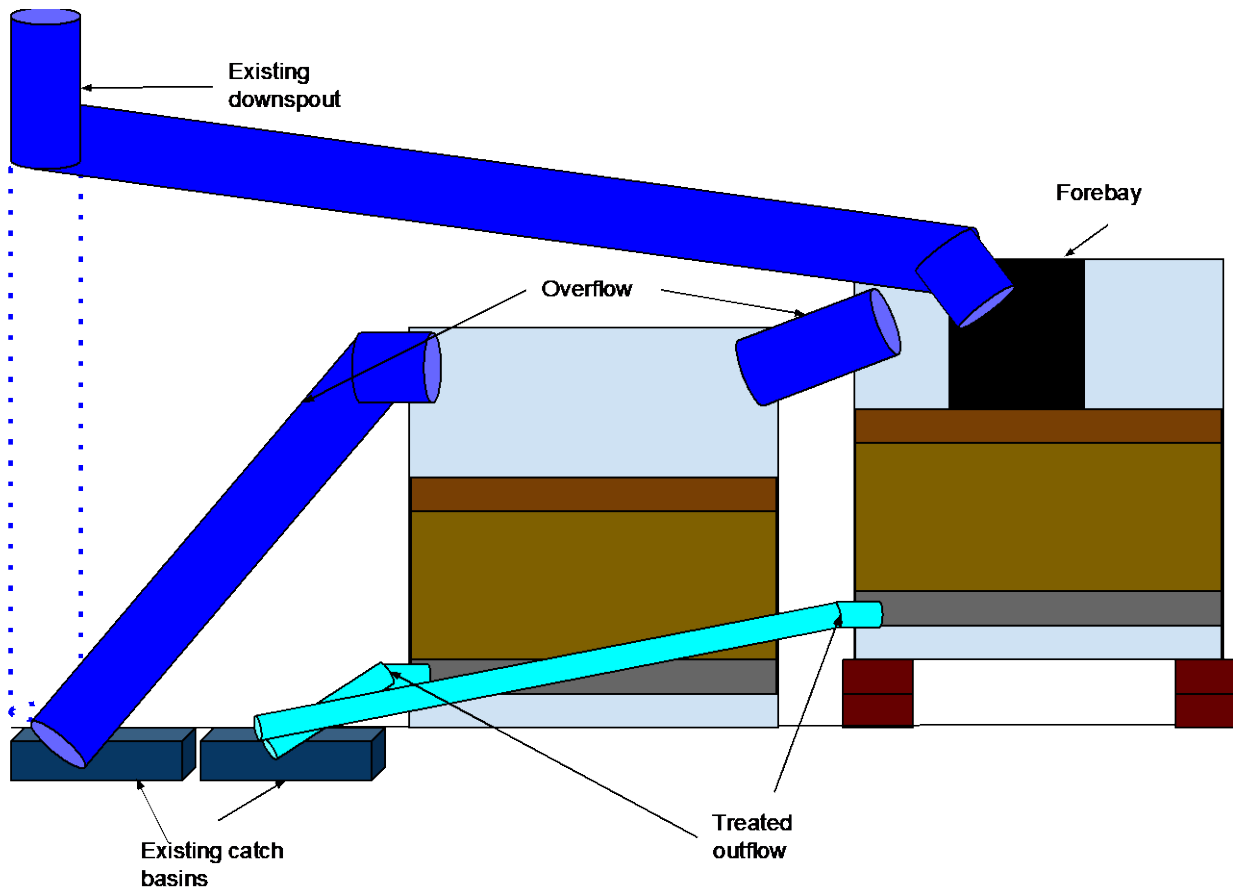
Side view of Site 1 configuration, connected box layout (not to scale).
